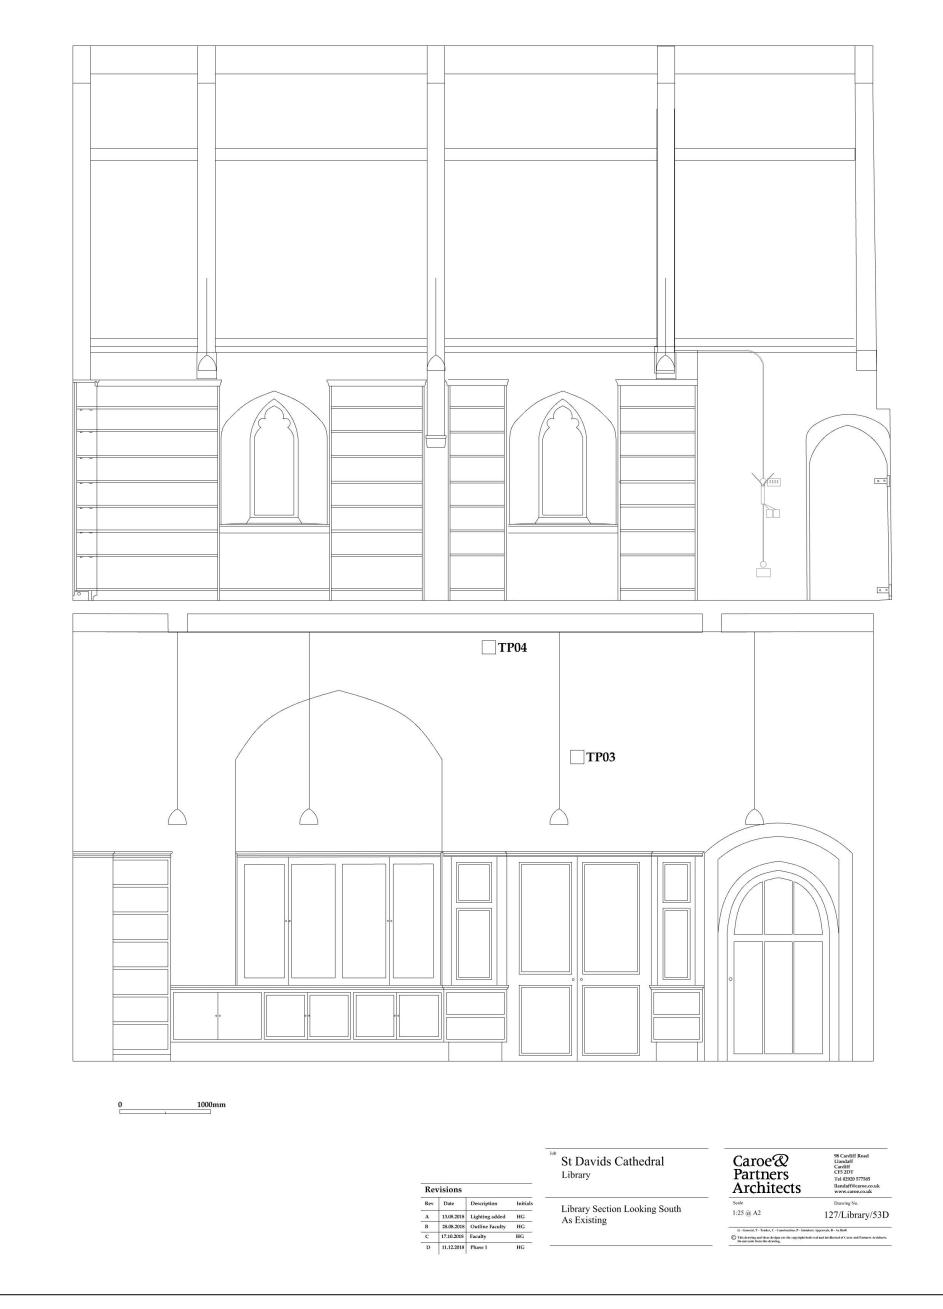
Test Patch Locations to North Wall – Library – St Davids Cathedral. © Caroe & Partners Architects & ArchaeoDomus.
